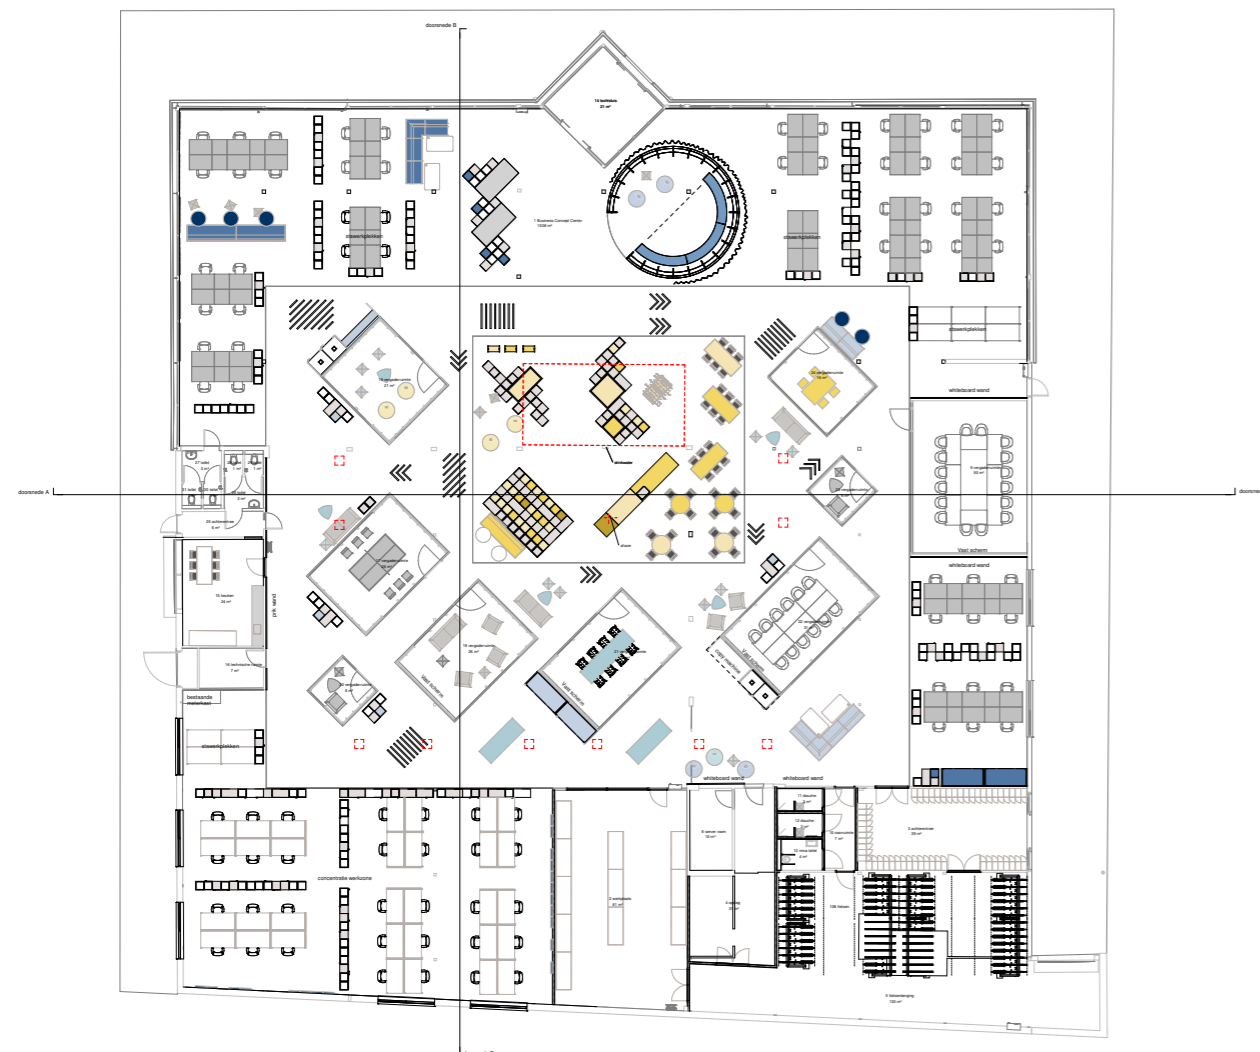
Floor plan of office for case study B. (Source: DOOR Architects) (Not to Scale)
